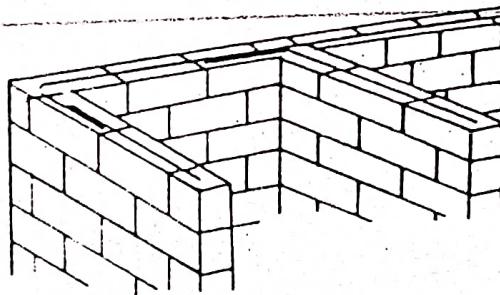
Proving horizontal reinforcement around corners and between intersecting walls
